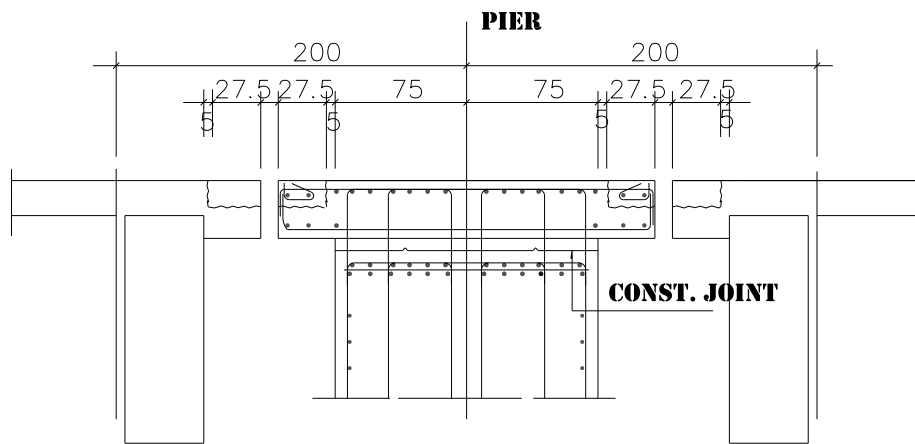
Deck Elevation View at Pier Expansion Joint
